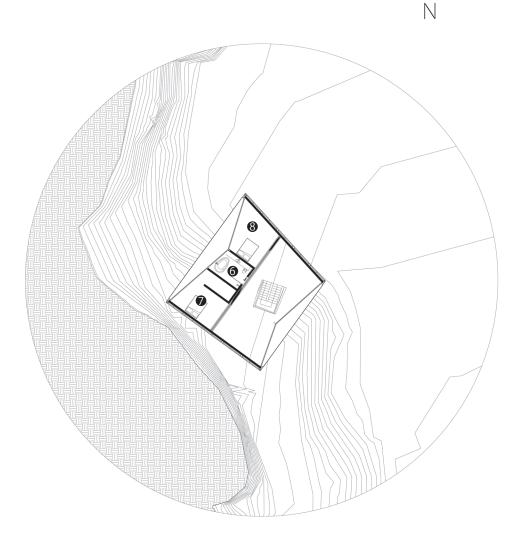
House 5 plans, Scale: 1:400 at A4 1:200 at A2
